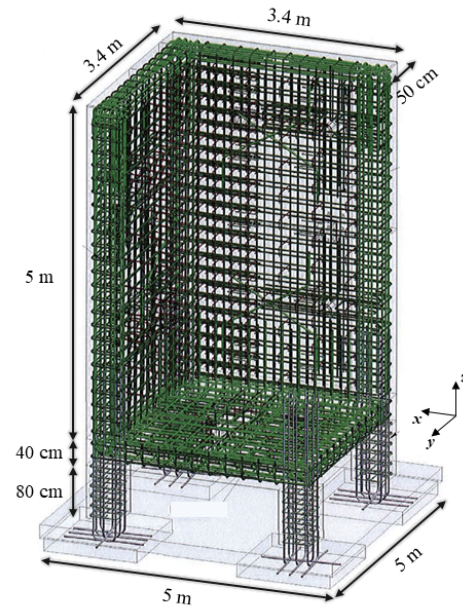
Configuration of the reinforcement of the reinforced concrete walls and slab.
